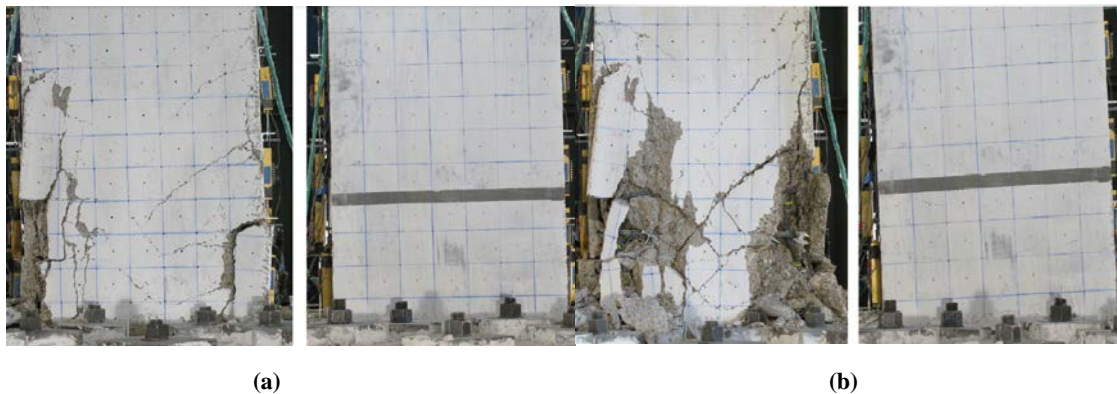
Experimental test results: (a) Conventional Reinforced Concrete Column (left) and UHP-FRC Column (right) at 2.75% drift ratio and (b) Conventional Reinforced Concrete Column (left) and UHP-FRC Column (right) at 5.25% drift ratio (21).
